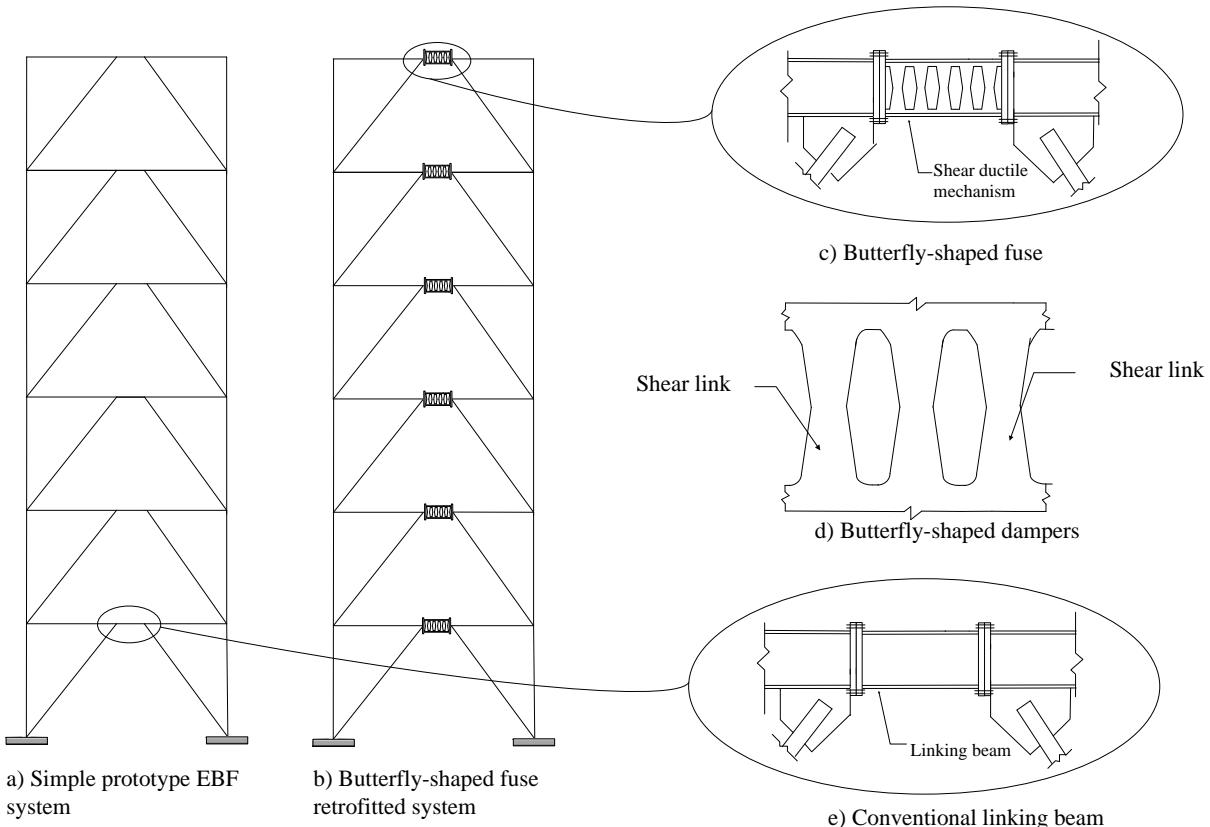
Schematic representation of the original building (a) and retrofitted building (b) and the structural detailing
